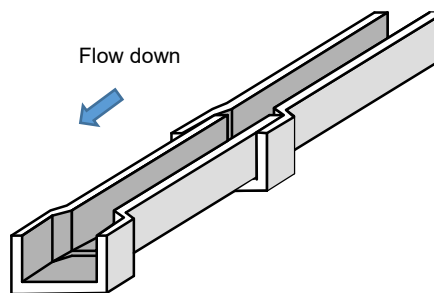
Example of repairing of crack on the surface drainage system (Source: JET)
